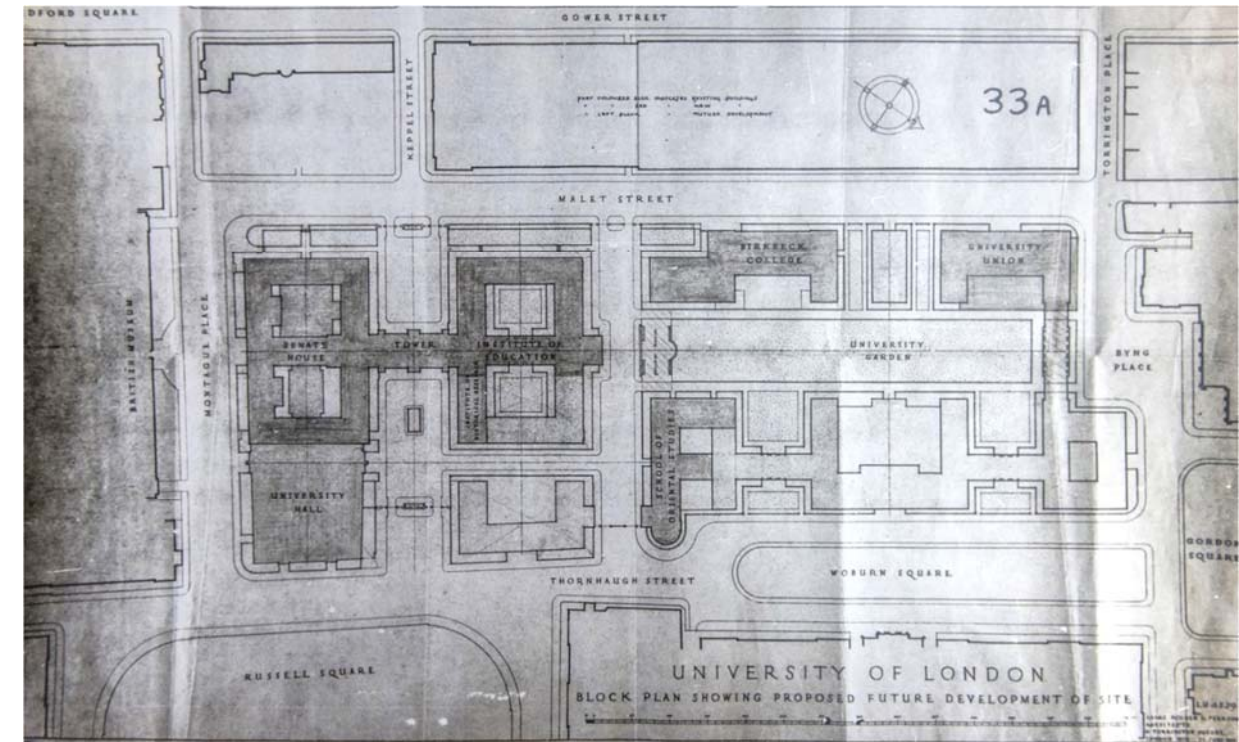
A plan showing the finalised design of the Senate House. Source: Camden Local Studies and Archives Centre.
